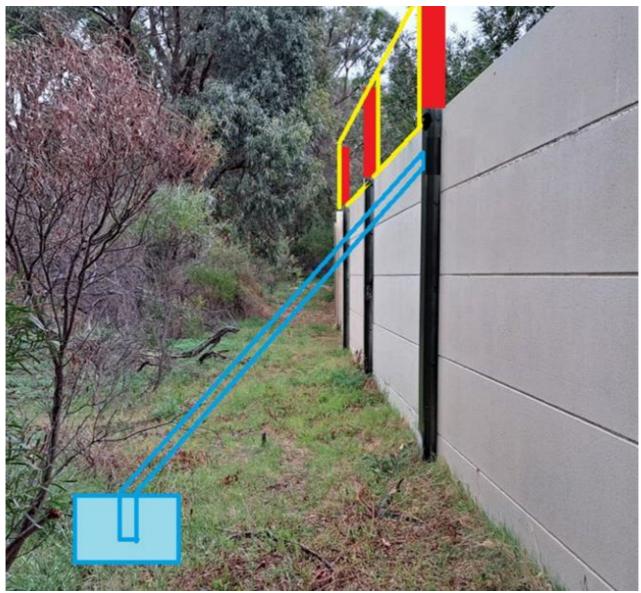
Contingency Back Stay, Should Existing Footing not Meet Future Wind Loading Requirements
